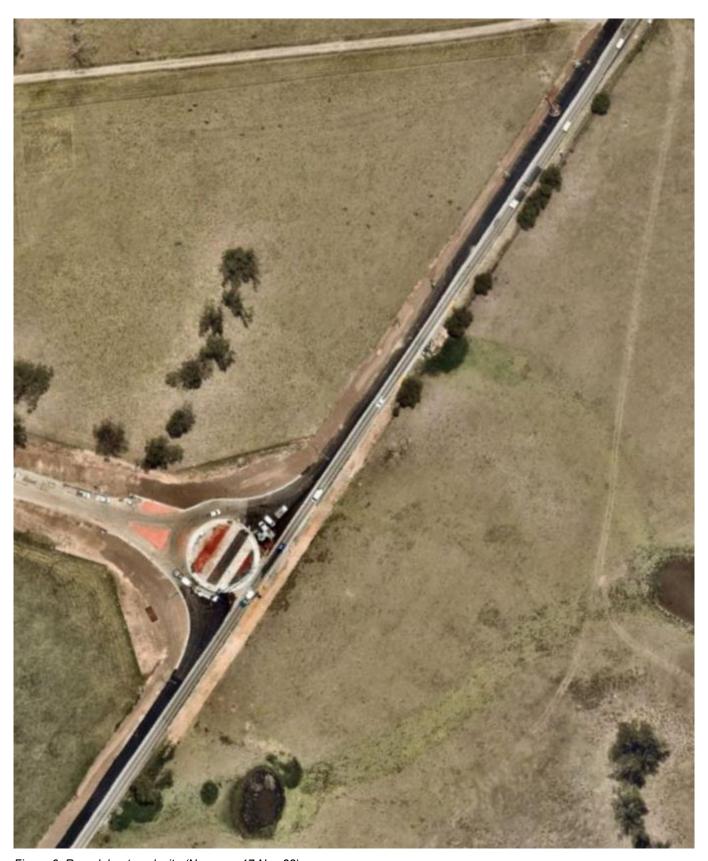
Roundabout work site (Nearmap 17 Nov 23)
